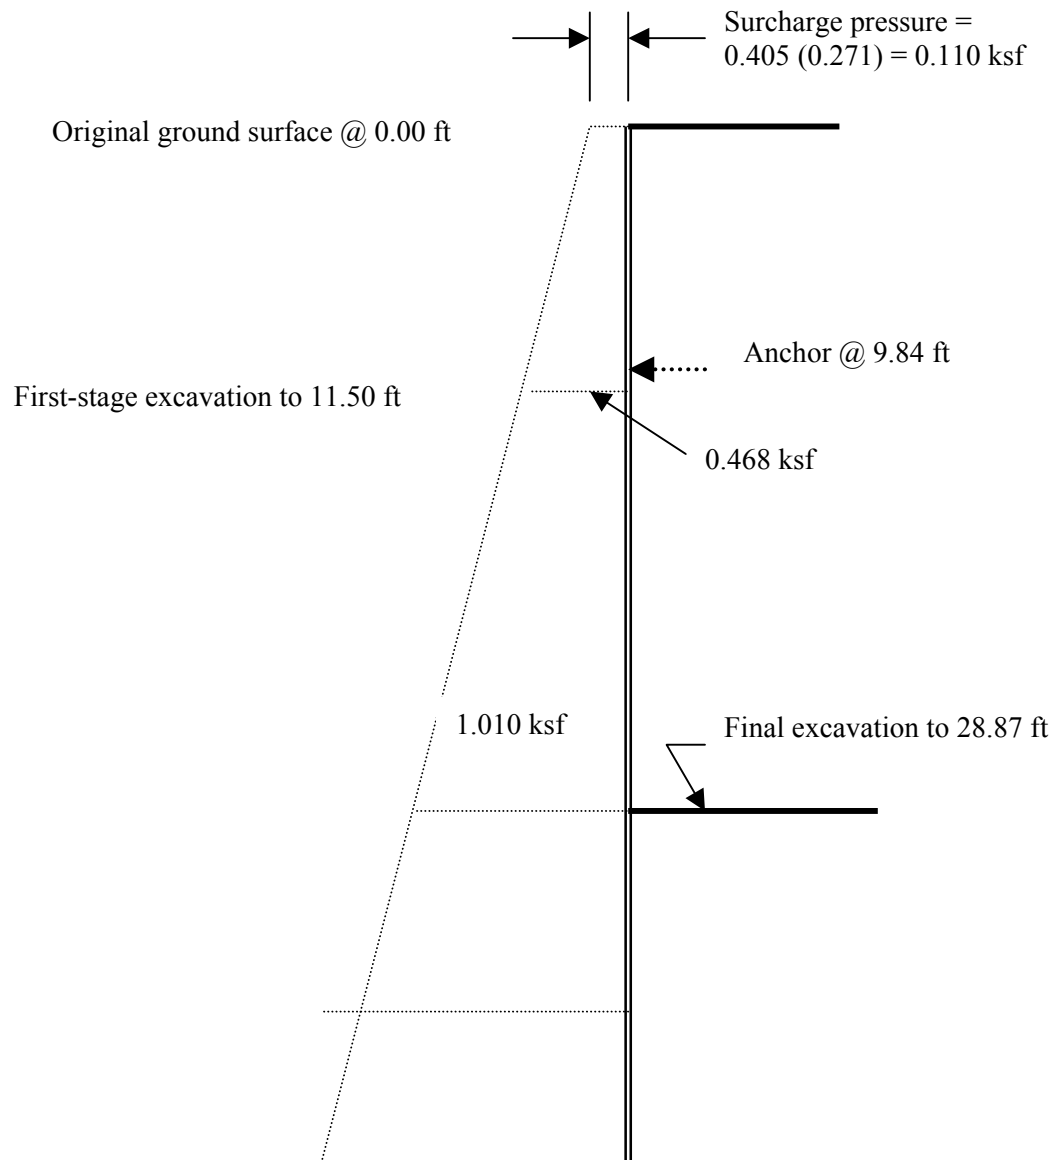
Excavation and tieback locations—driving side earth pressures at excavation levels
